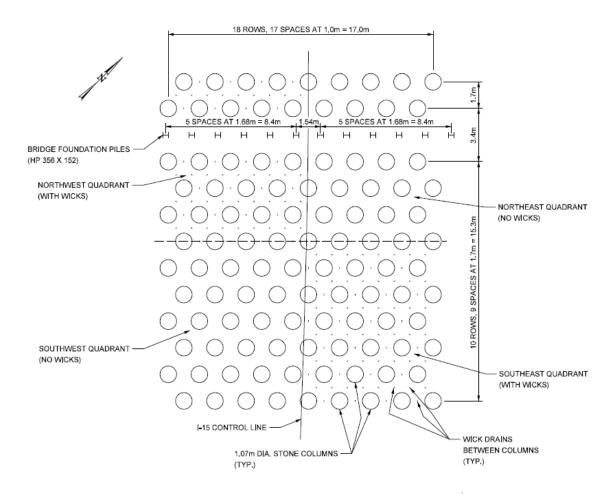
Layout of stone columns and wick drains in the test area at the 24th Street Bridge case history.
